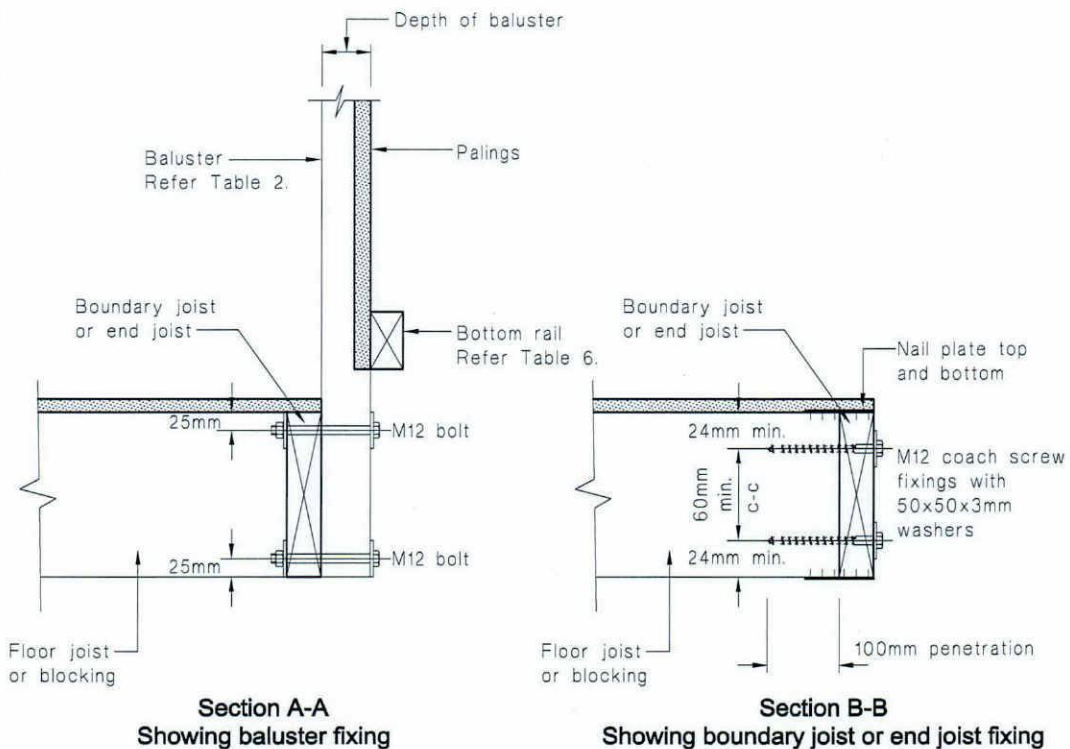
Baluster Fixed to Boundary Joist or End Joist
